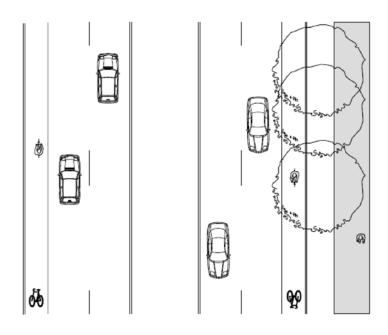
F Sub-arterial Road Type B with kerb and channel
